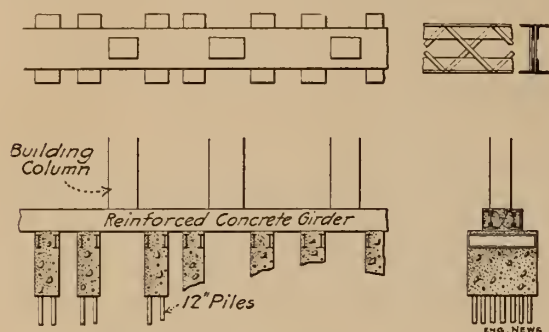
SKETCH ILLUSTRATING UNDERPINNING WITH REINFORCED-CONCRETE GIRDER
